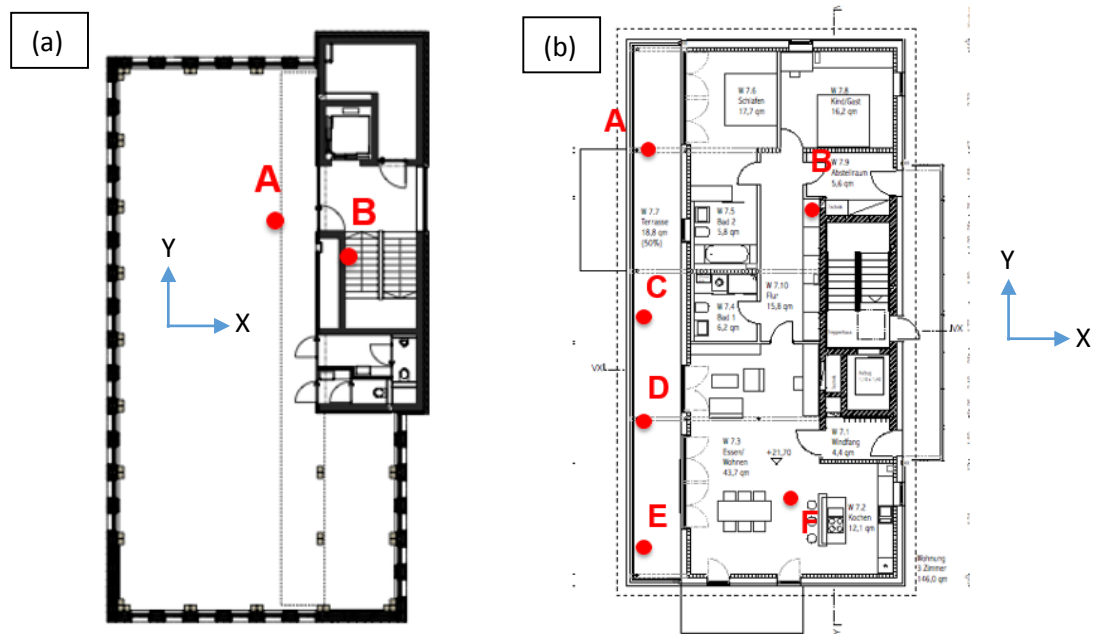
(a) Roof plan of LCT ONE building; (b) Top floor plan of H8 building
